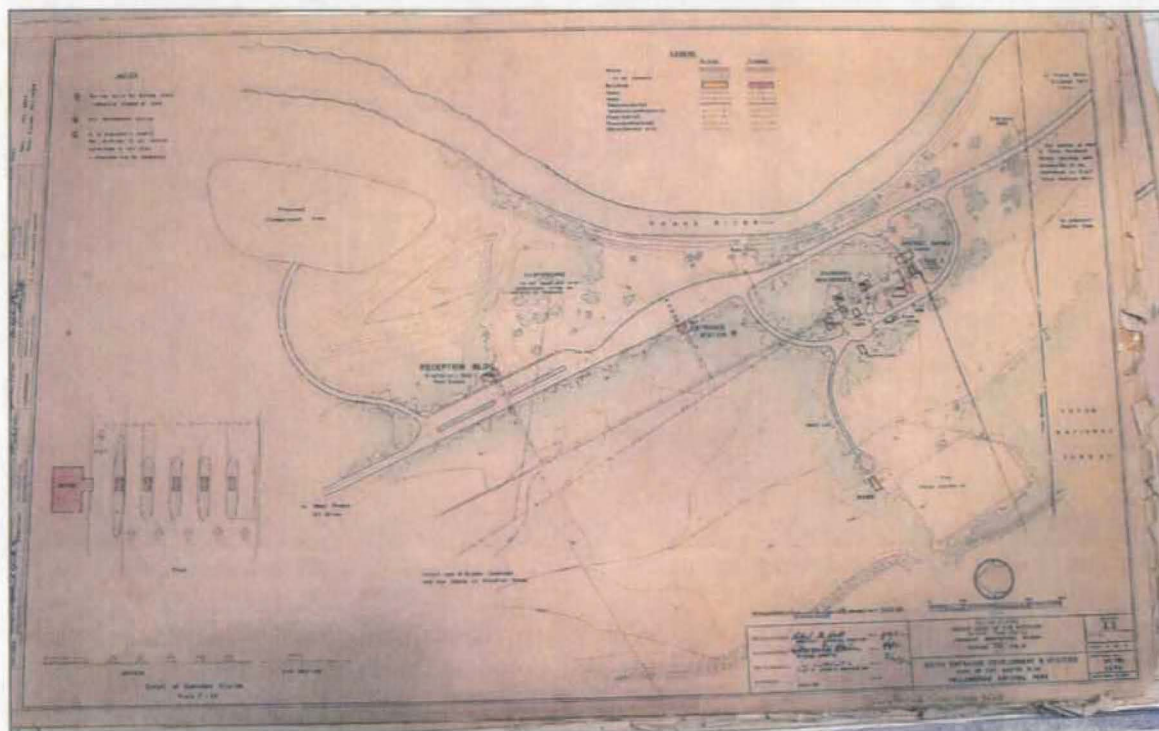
Photo image of 1962 Master Plan, drawing is dated 1951-52
